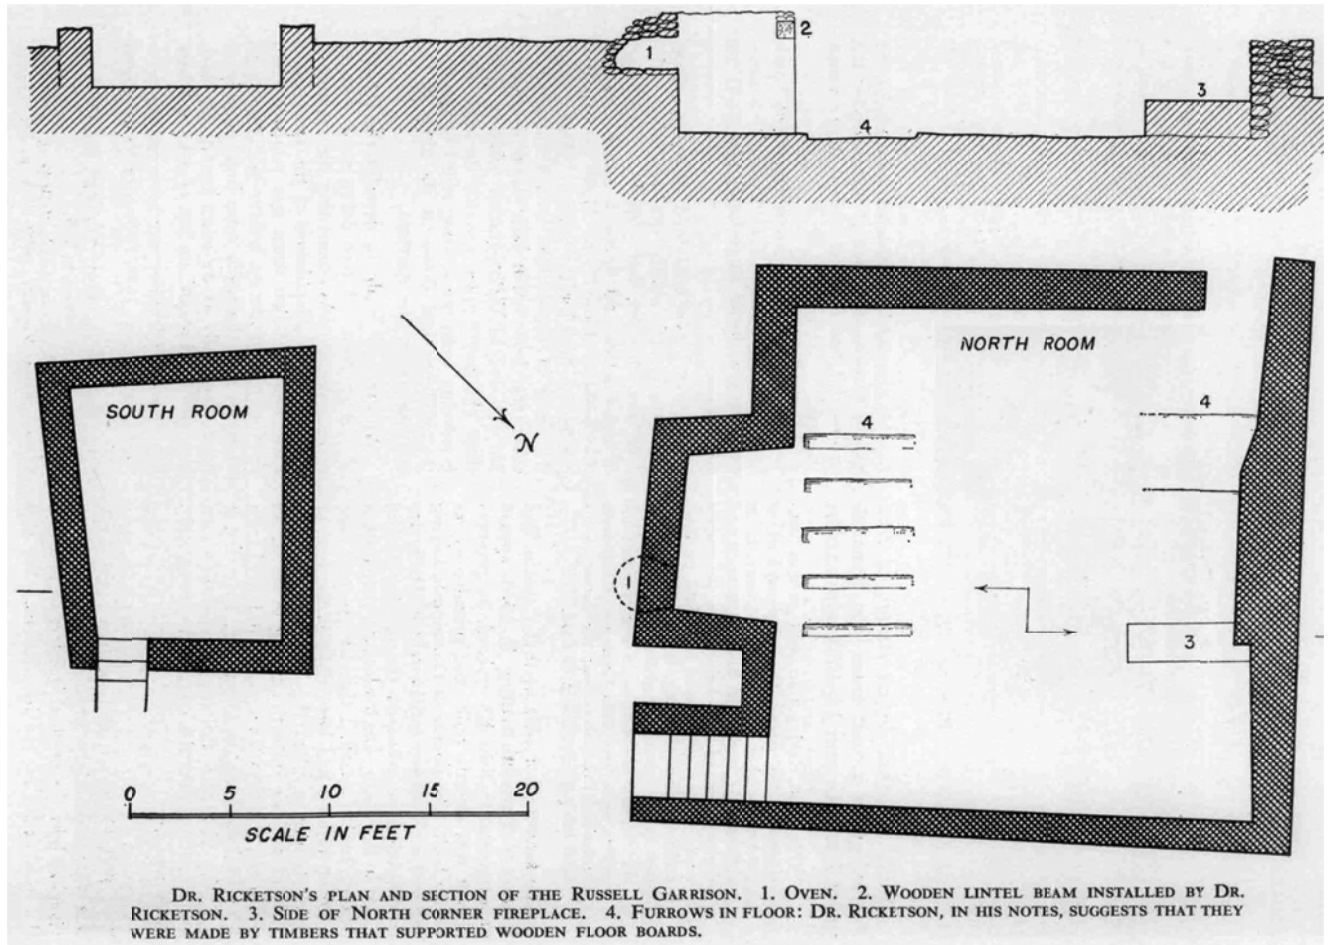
Detail of Russell Garrison site plan (source: Ricketson 1964:8-9).
